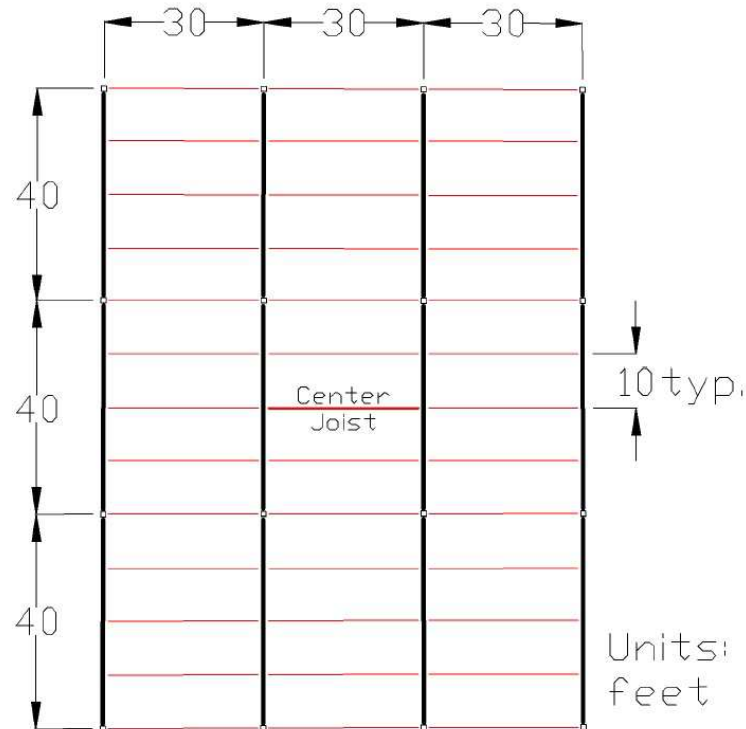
Plan view of the structure showing the location of OWSJs (red) and girders (black)
